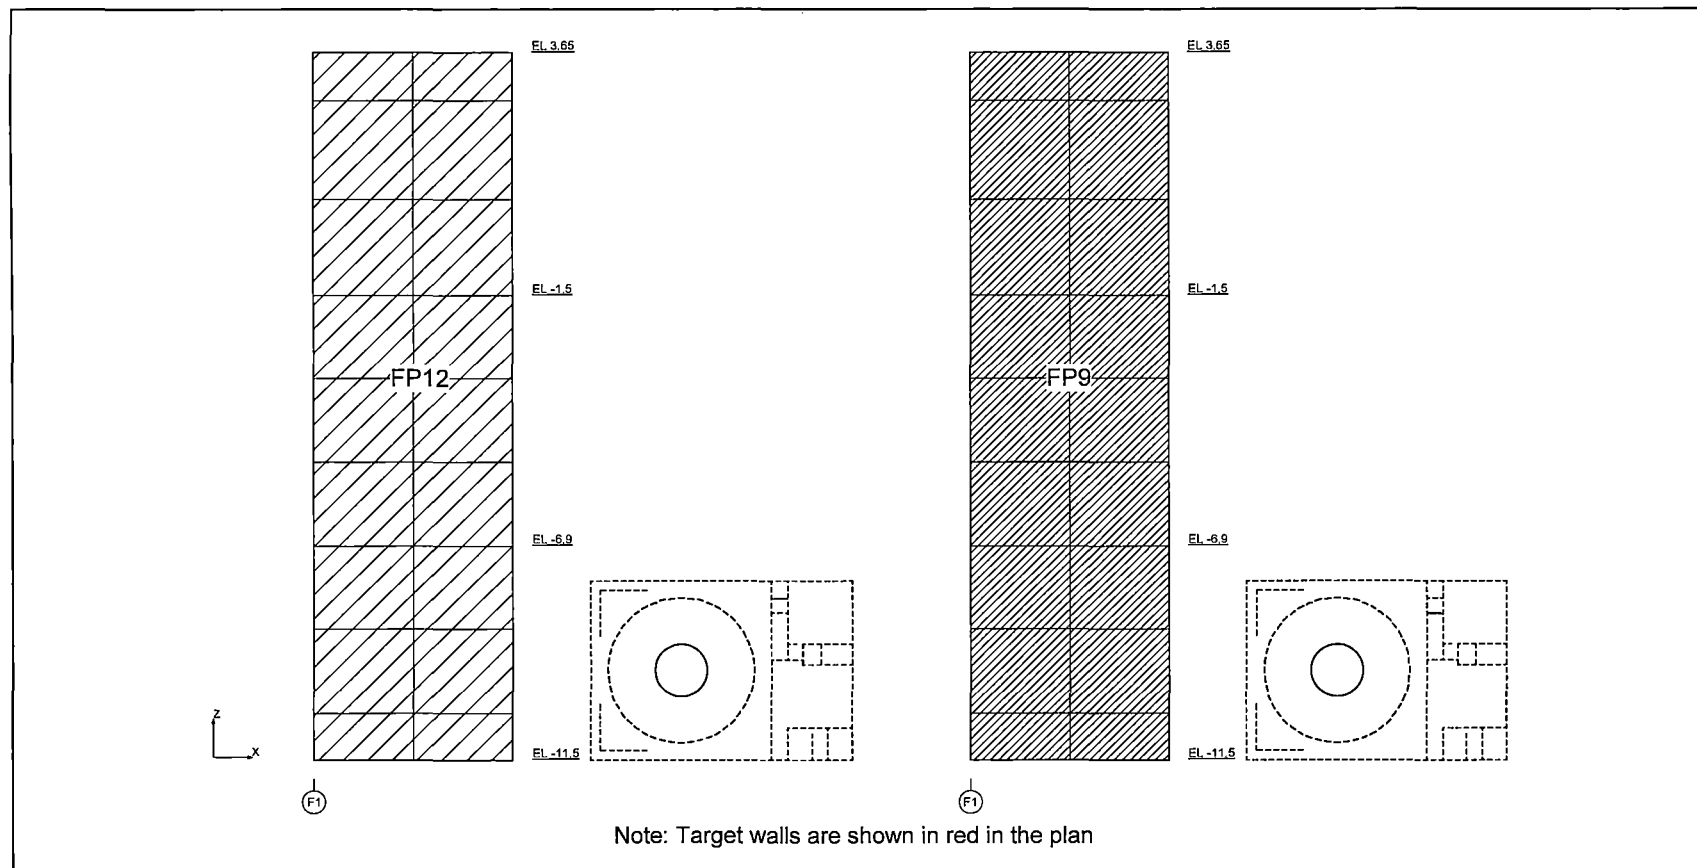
Application of Thermal Load on the Spent Fuel Pool Wall-2
